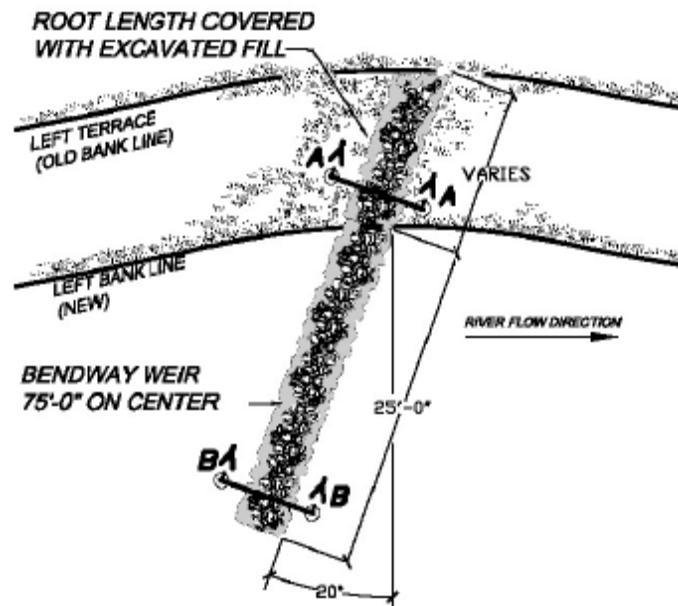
Bendway-weir design plan view (from BIO-WEST (2006))
